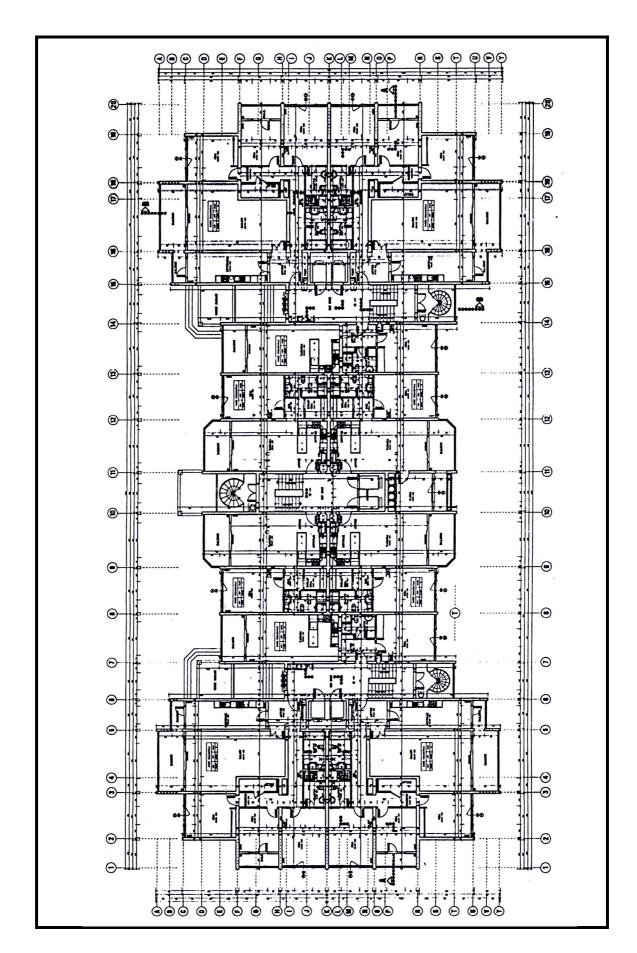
Mavişehir II; Kuğu 1st-Floor Plan
